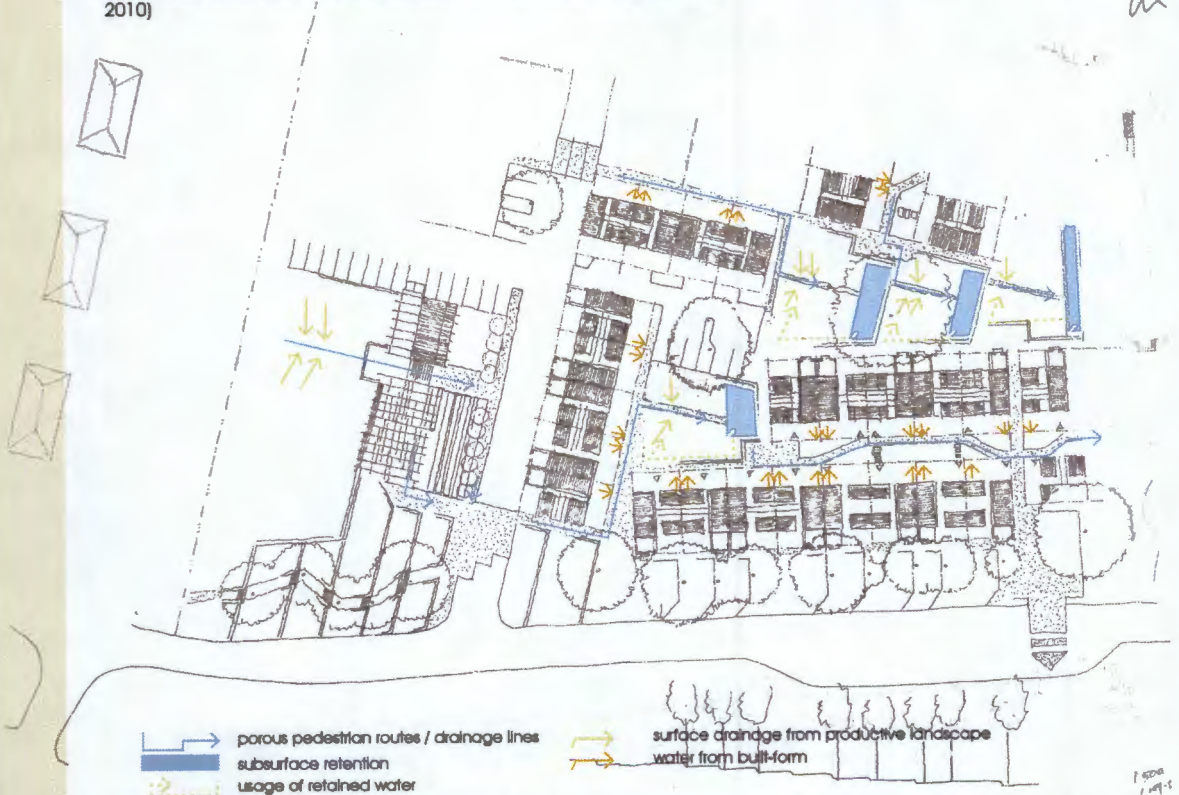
Site plan: Water reticulation (image by author 2010)
